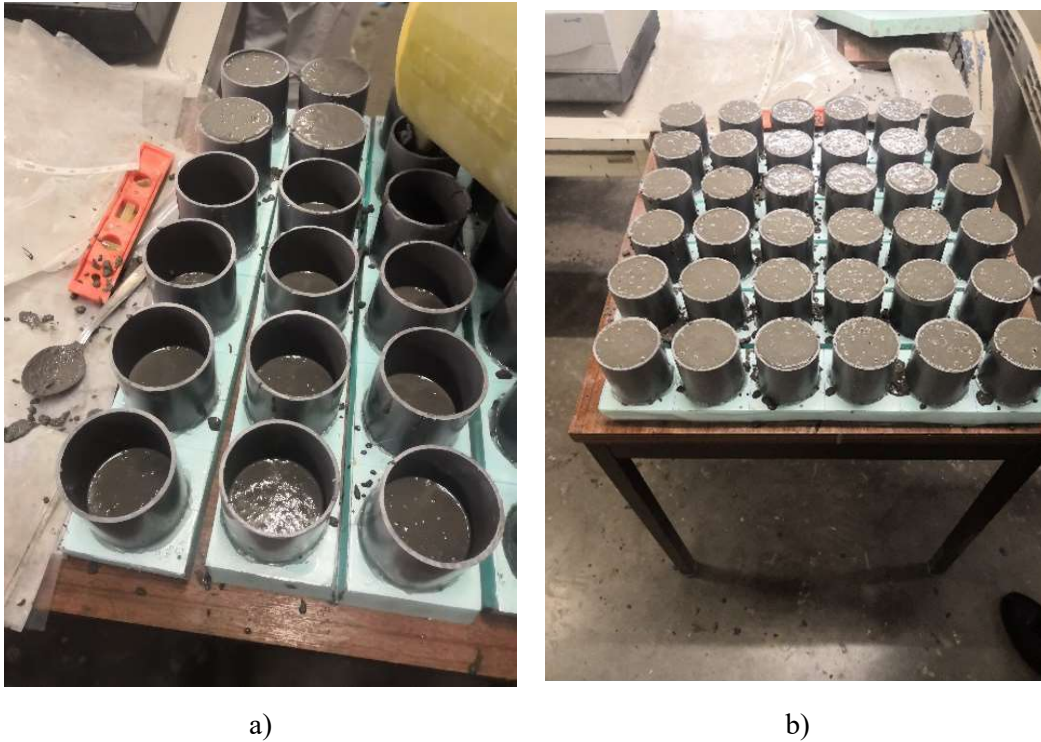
Casting of the specimens for the pull-out tests: a) Carefully covering the fibre with concrete using a spoon; b) moulds completely filled
